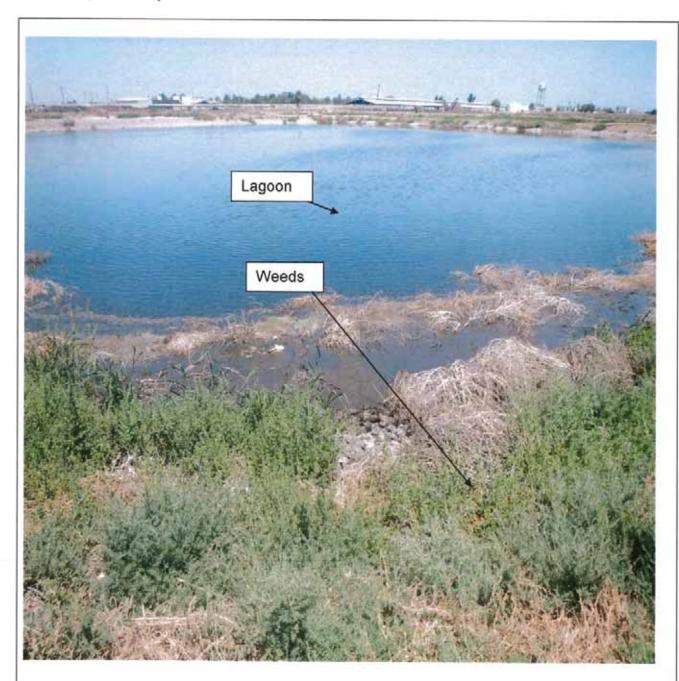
Photo of a lagoon with excessive vegetation on its inner and outer embankments.
